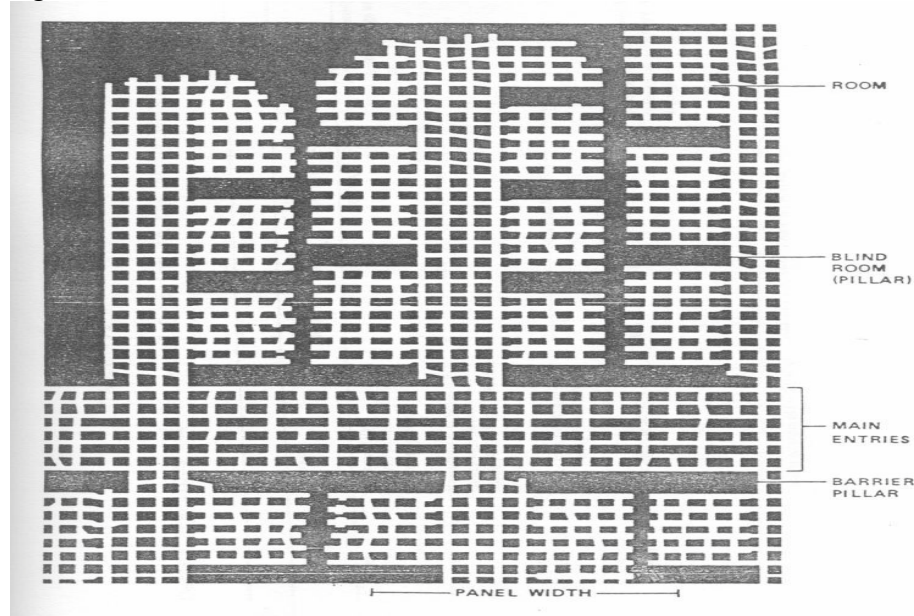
A typical room-and-pillar layout (Mishra, 1992)
